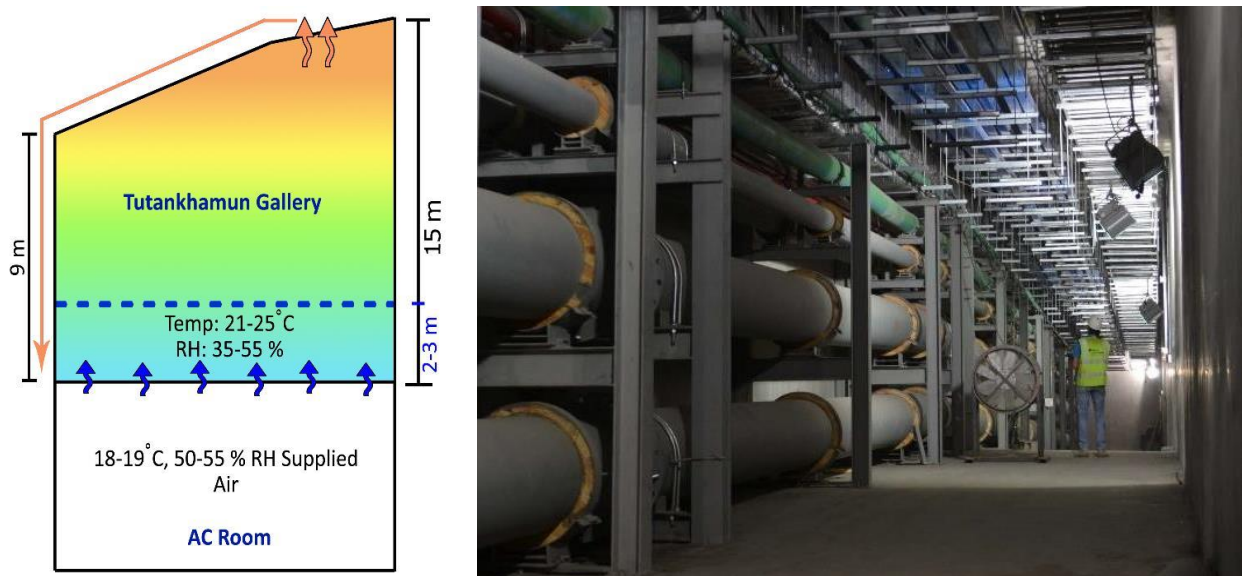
HVAC system at GEM. Left: plan of exhibit halls and HVAC operation. Right: The huge underground plant.
